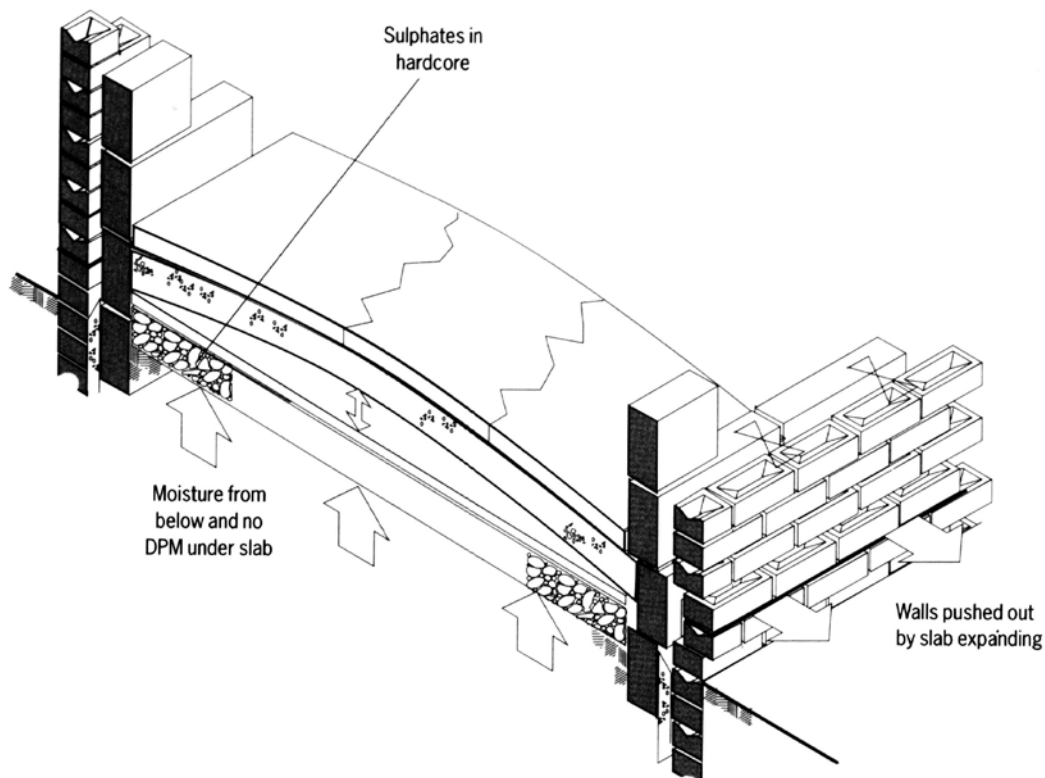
Doming and cracking of floor slab and outward displacement of walls resulting from expansion of concrete due to sulfate attack.
